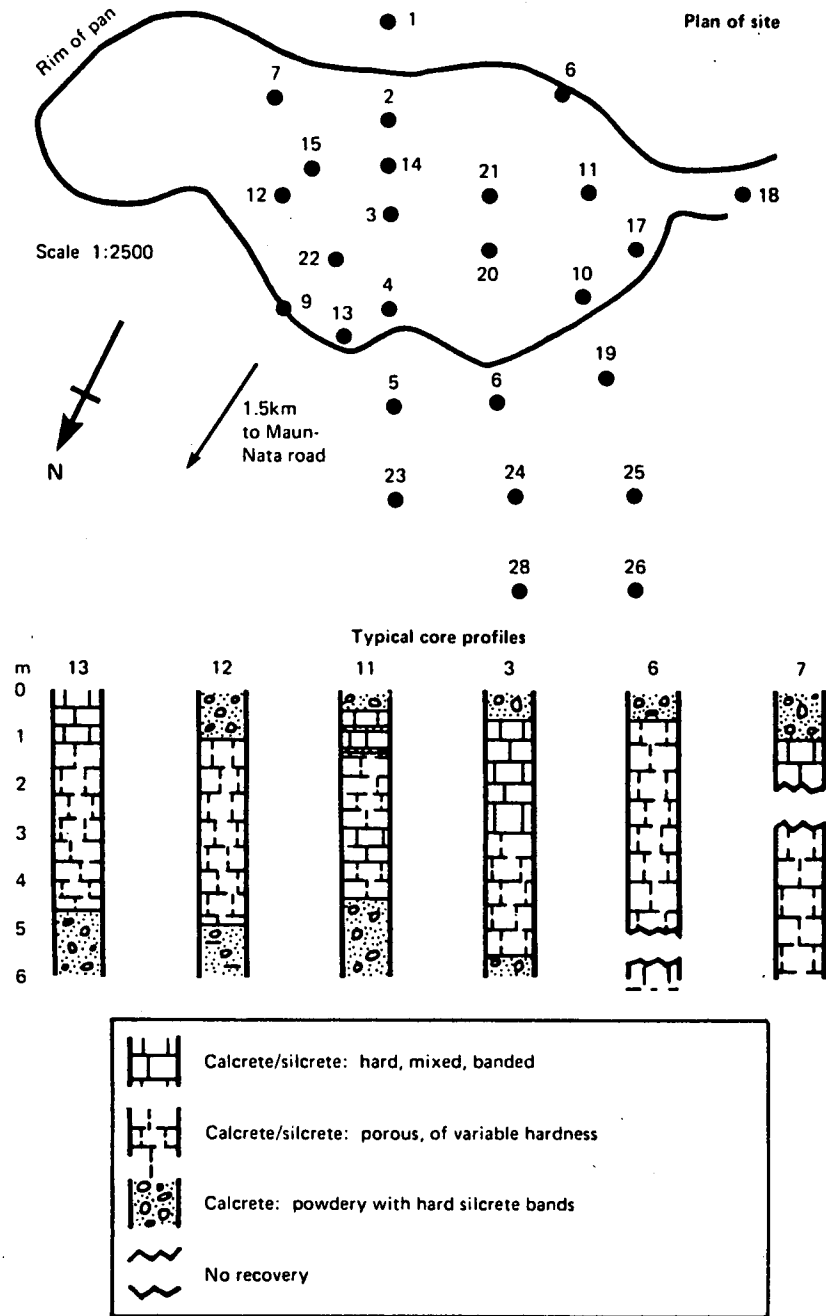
Borehole location and typical profiles at MN2 site on Maun-Nata Road.
